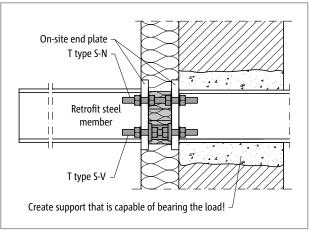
Schöck Isokorb® T type S for retrofitted cantilevered steel structure; further examples of renovation see p. 90
